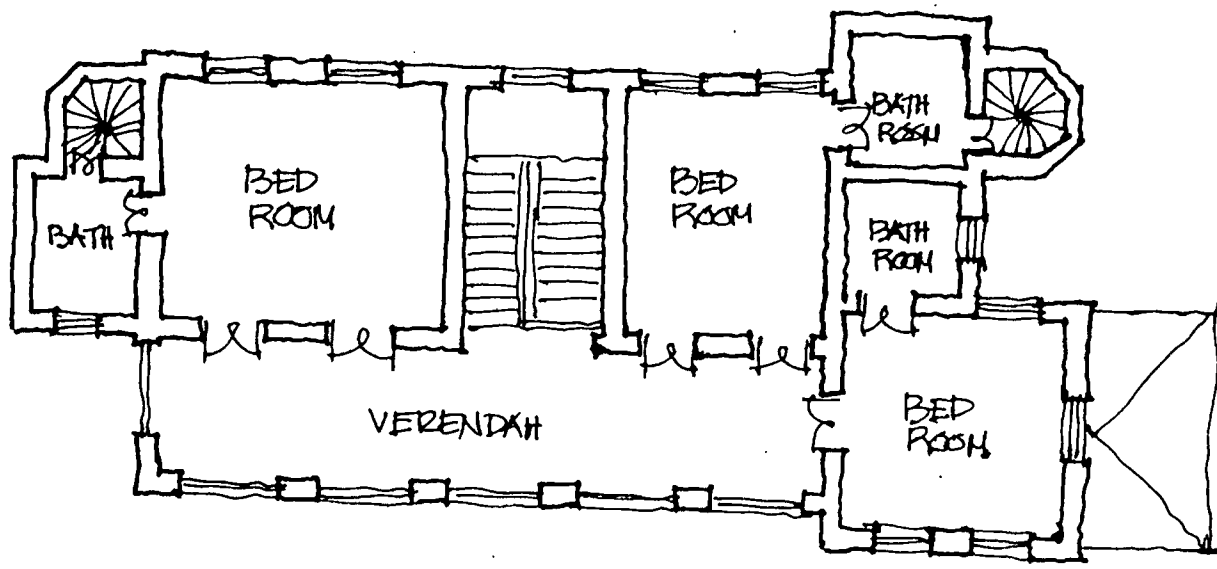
First floor plan, Civil surgeon bungalow, Khulna
